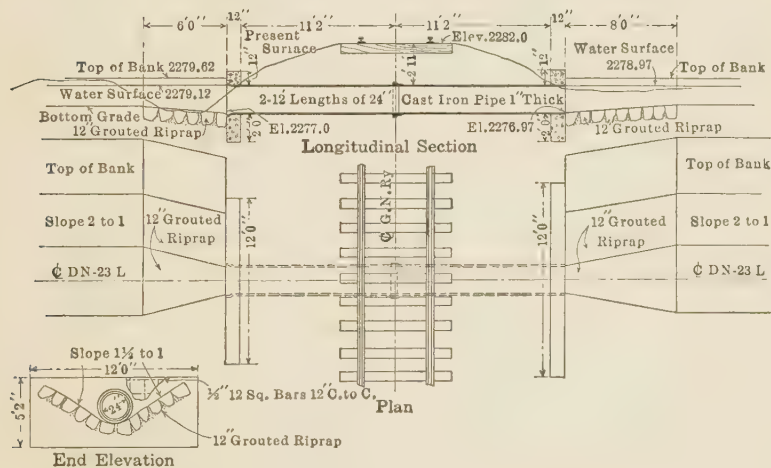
Cast-iron culvert under Great Northern Railway. Milk River Project, Mont.
